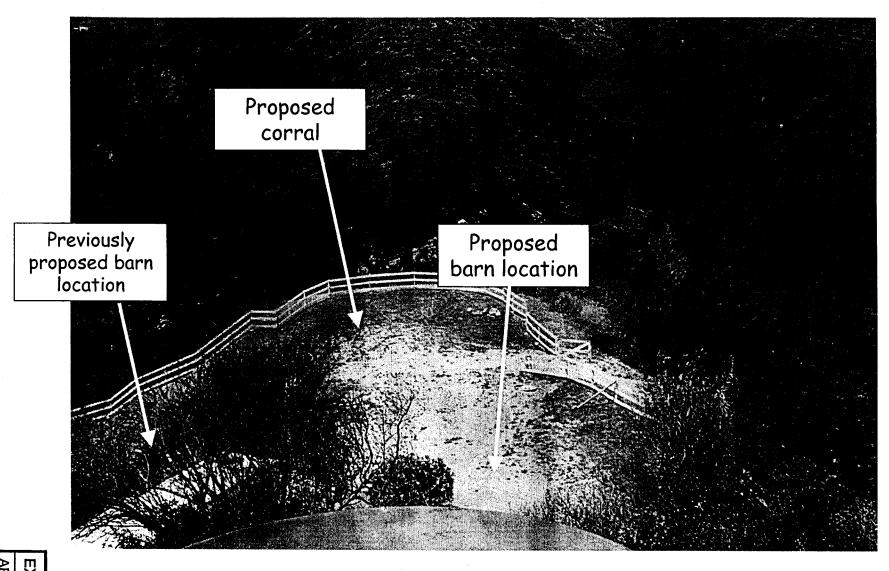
Barn site, with water tank in foreground and canyon in background. View is to the west.
